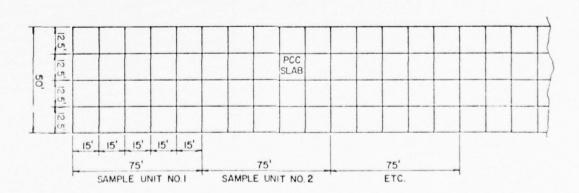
Example division of a pavement section into sample units of 20 slabs.
